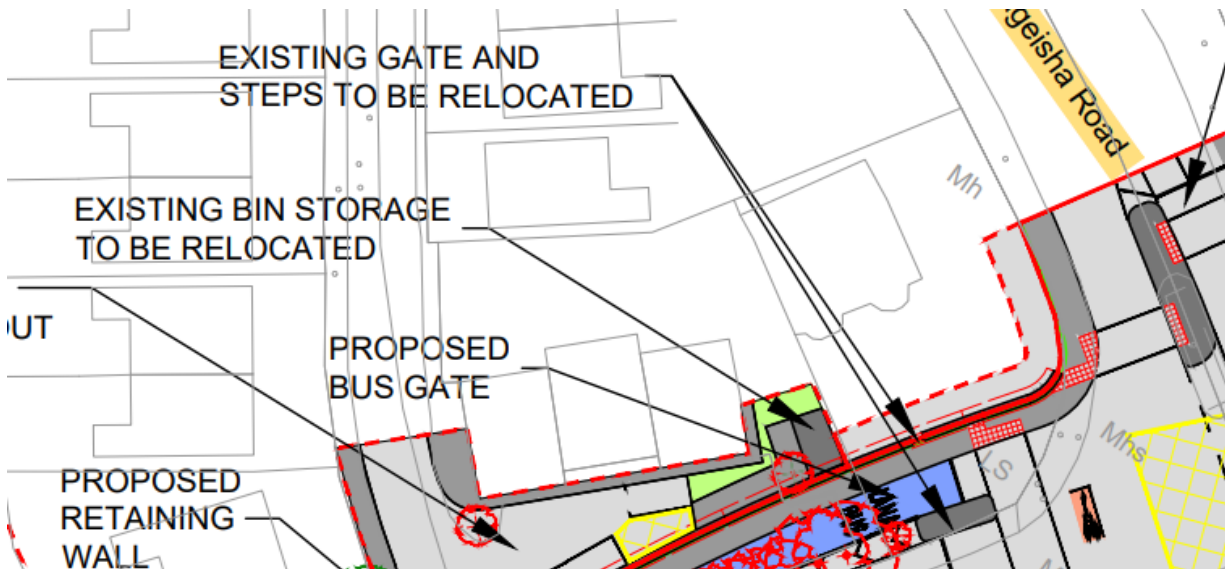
General Arrangement of Proposed Scheme at Bayview House B&B
